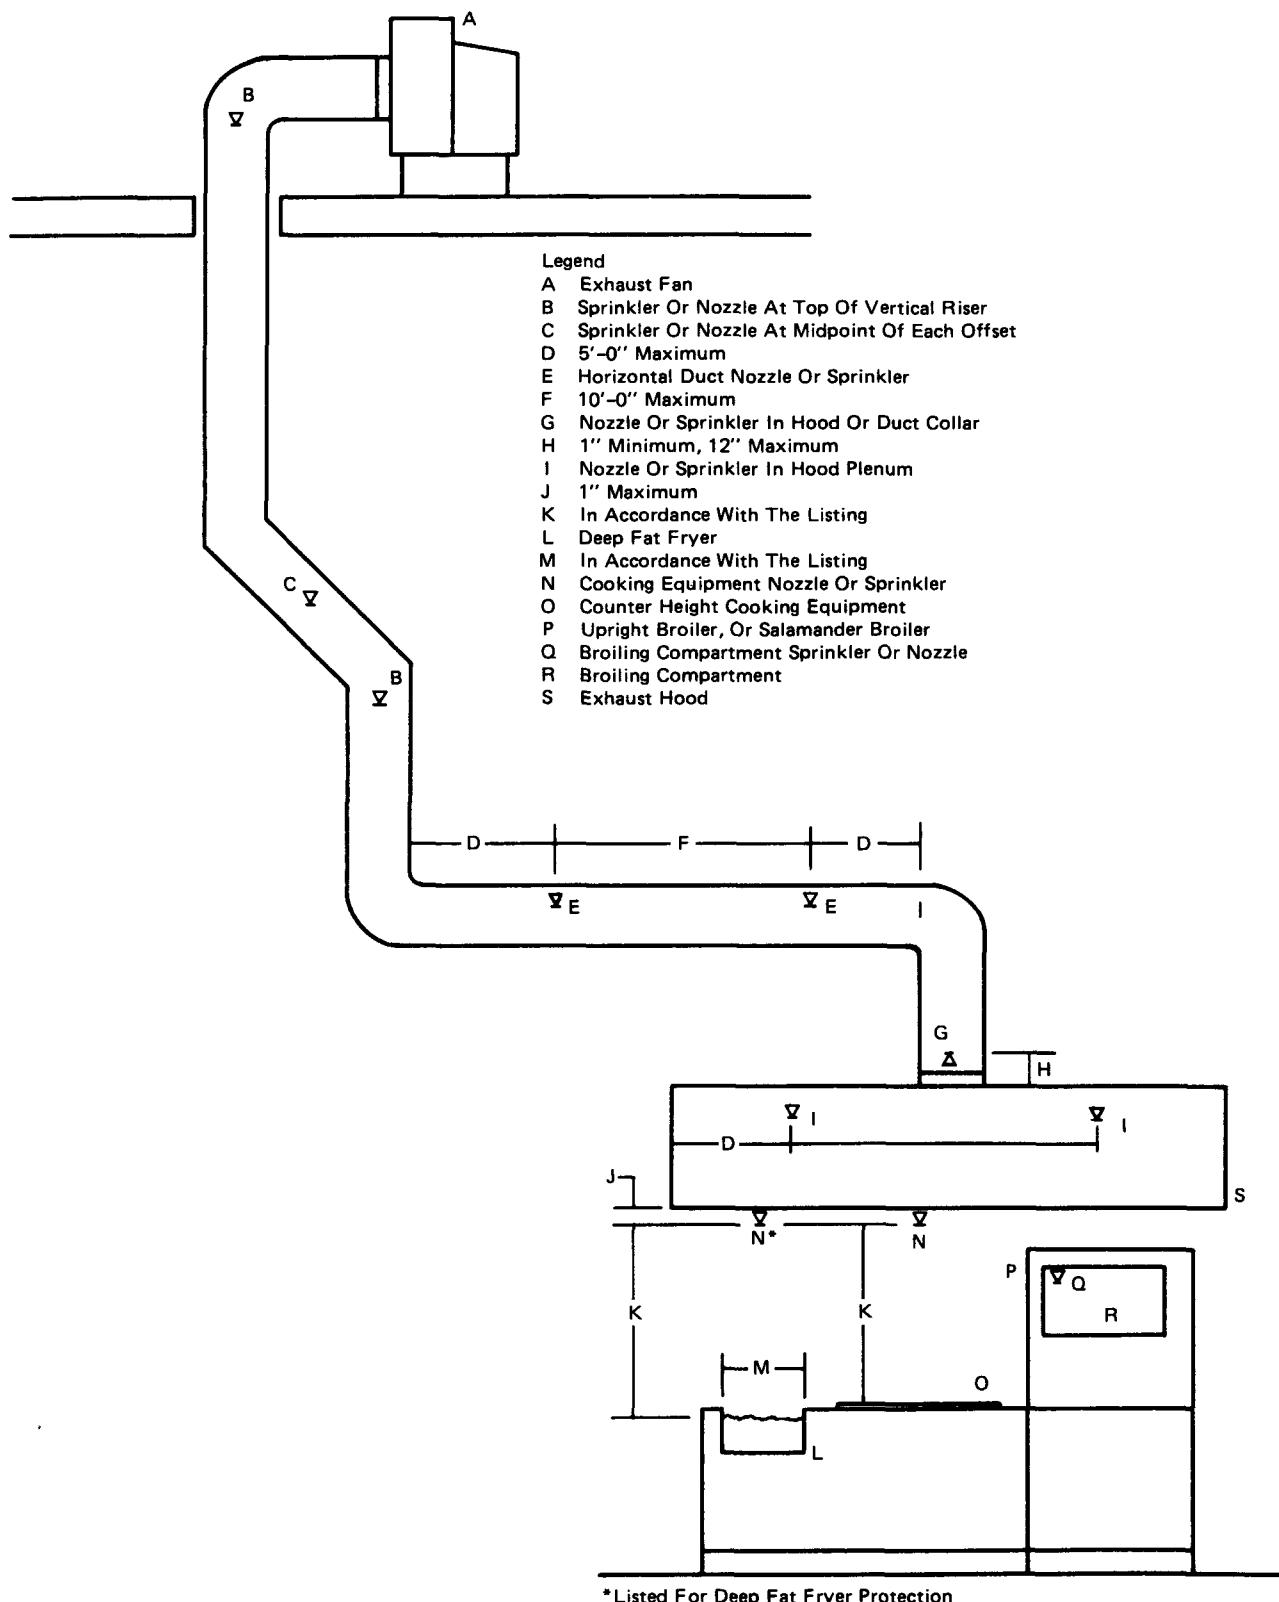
Typical installation showing automatic sprinklers or automatic nozzles being used for the protection of commercial cooking equipment and ventilation systems.
